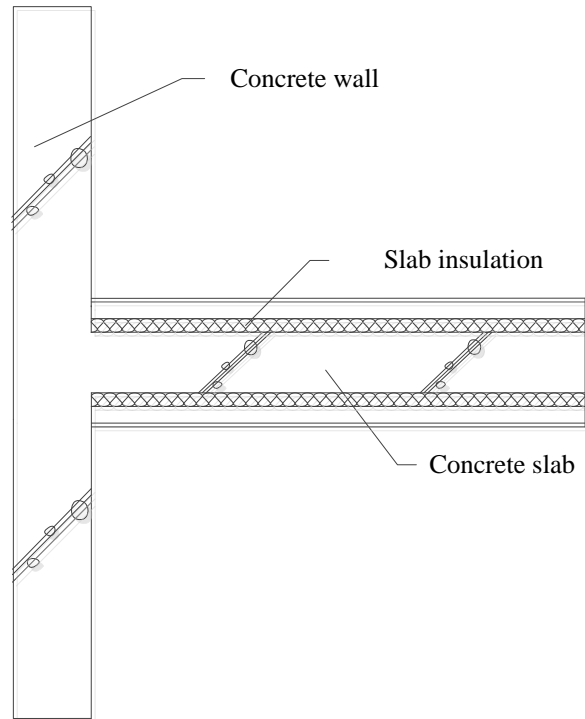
Section view of the slab with uniform horizontal insulation and exterior wall sections considered for the two-dimensional heat transfer slab model
